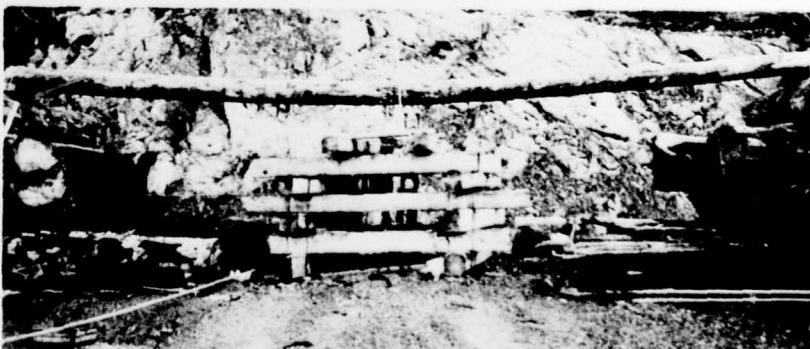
Log under load over a 70-foot span. Loads exceeding 120,000 pounds were required to break the strongest logs.
